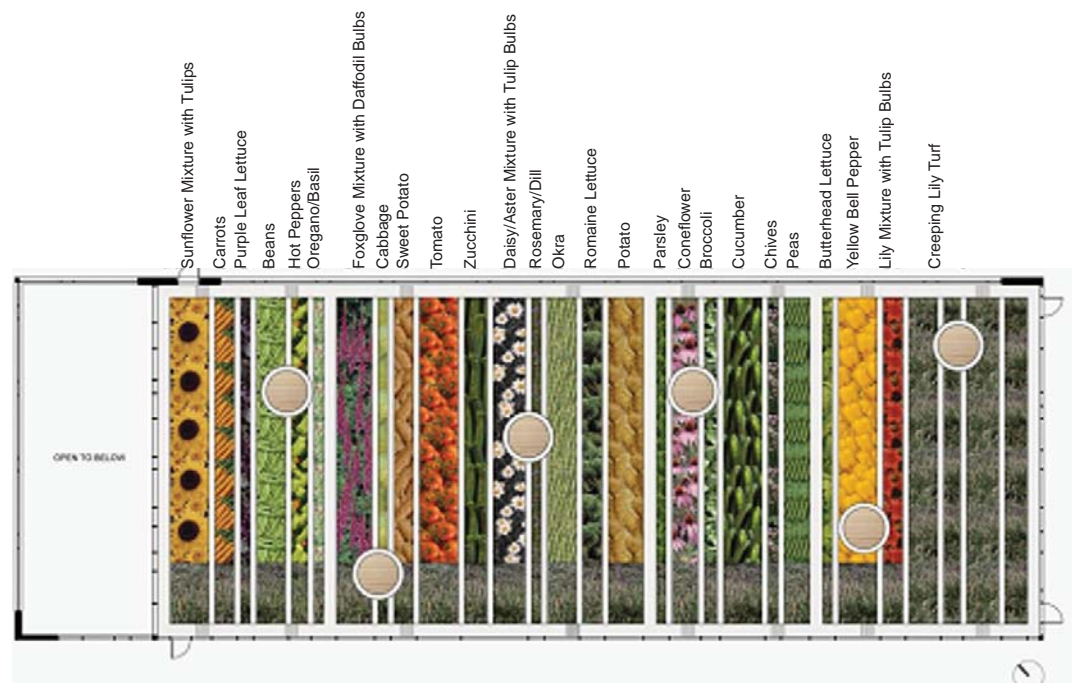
Gary Comer Roof Garden Plan, photo from greenroofs.com, accessed 2013.
